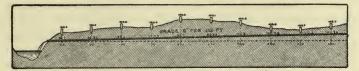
Showing elevation of the soil above datum, also elevation of drain at stations 50 feet apart, as entered from surveyor's blank.
